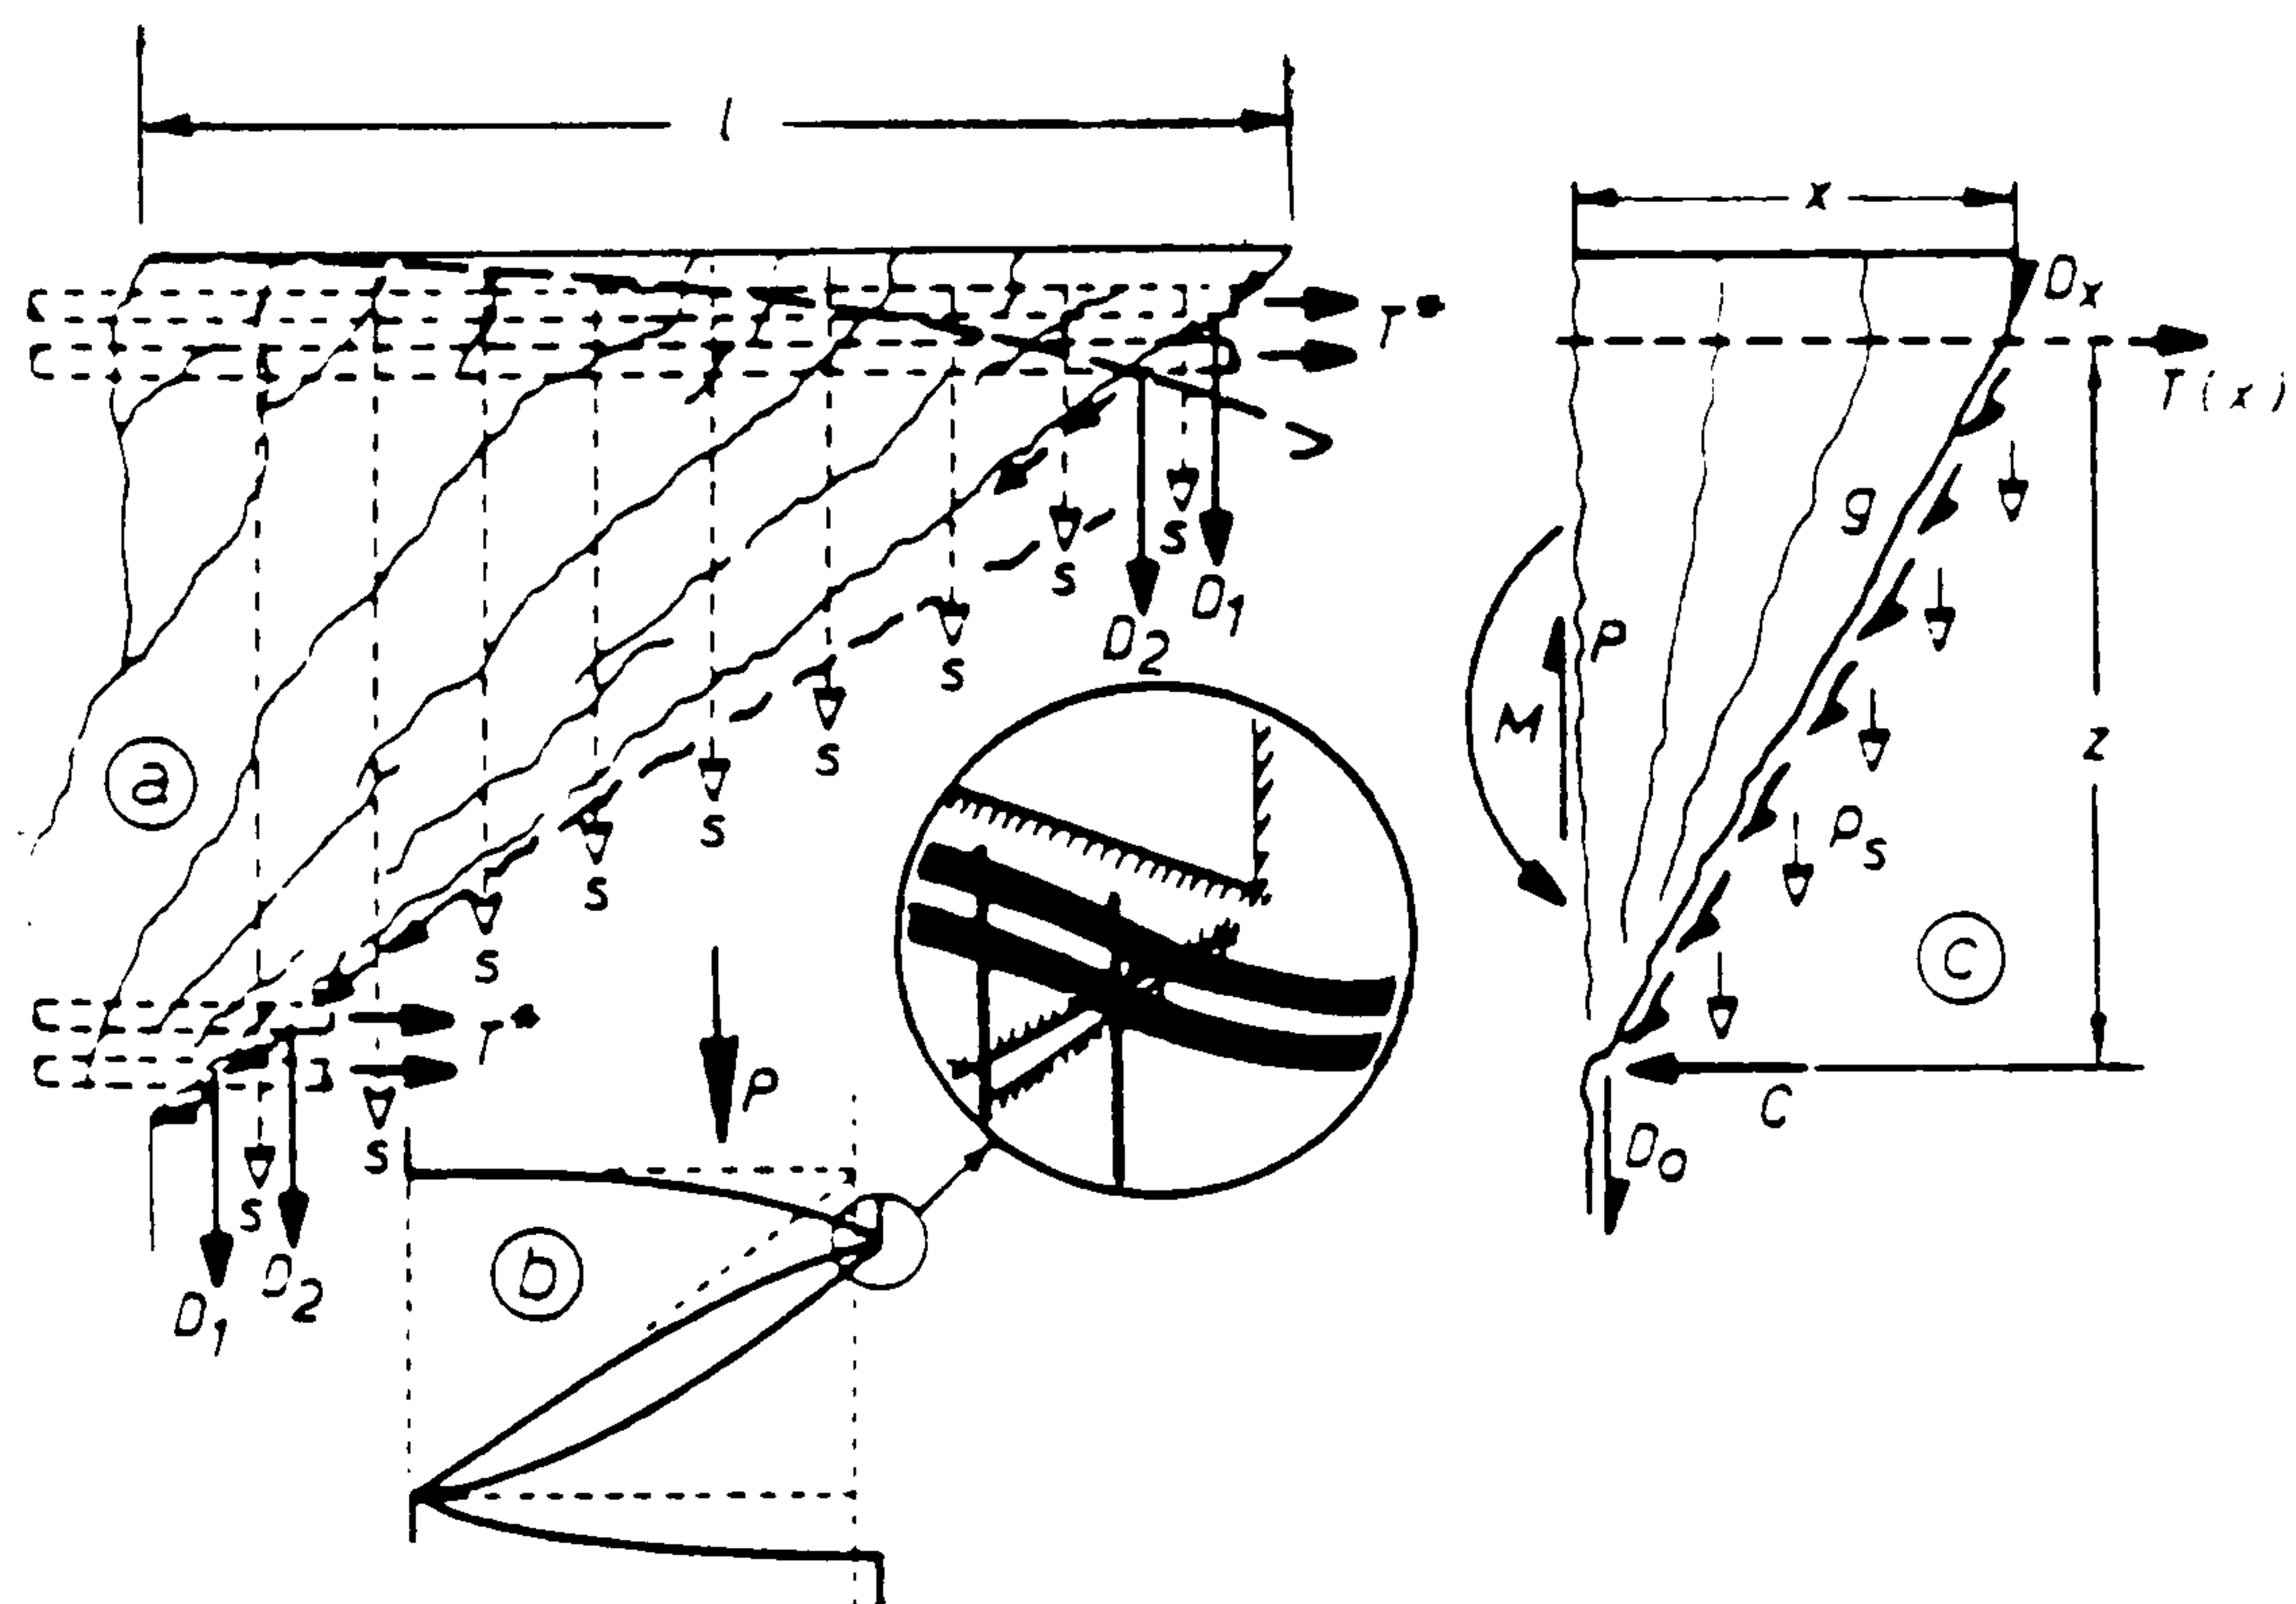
Diagonal tension failure mechanism and internal forces. Paulay [11]
